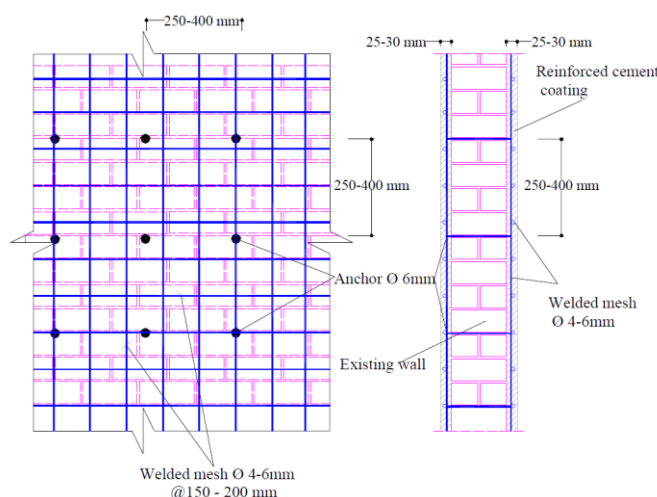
Example of Strengthening Walls using Ferrocement (ElGawady, et al., 2004)
